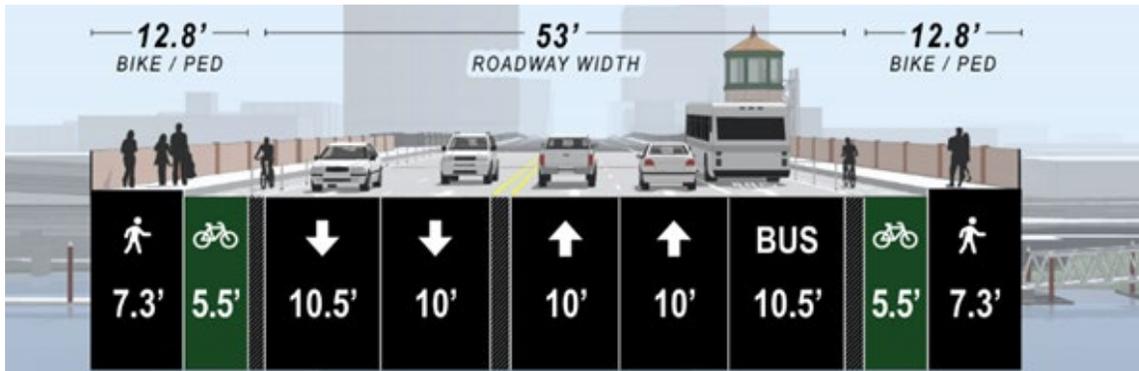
Bridge Cross Section Over River – Draft EIS Long-Span Alternative
